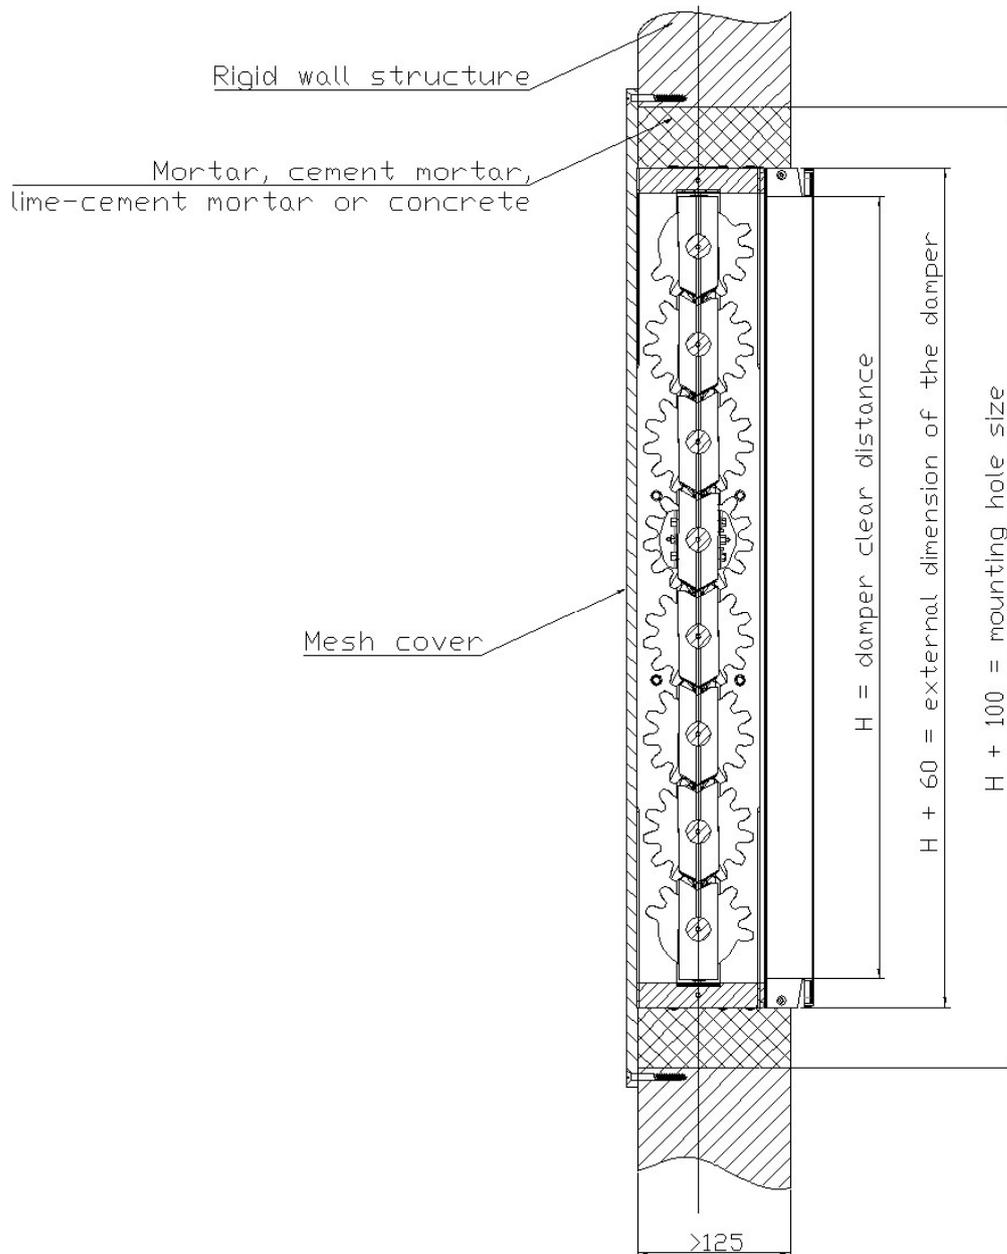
Installation method of fire dampers WKP-O in structures thicker than 125 mm
